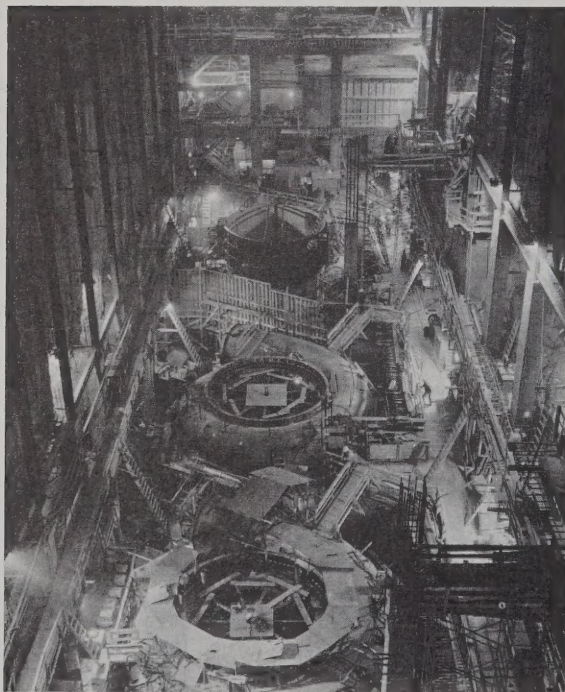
The Northfield Mountain pumped storage project in Massachusetts features an underground powerhouse with four reversible units. The 1,000-megawatt plant with a gross static head of 824 feet is expected to be in operation in 1972.
